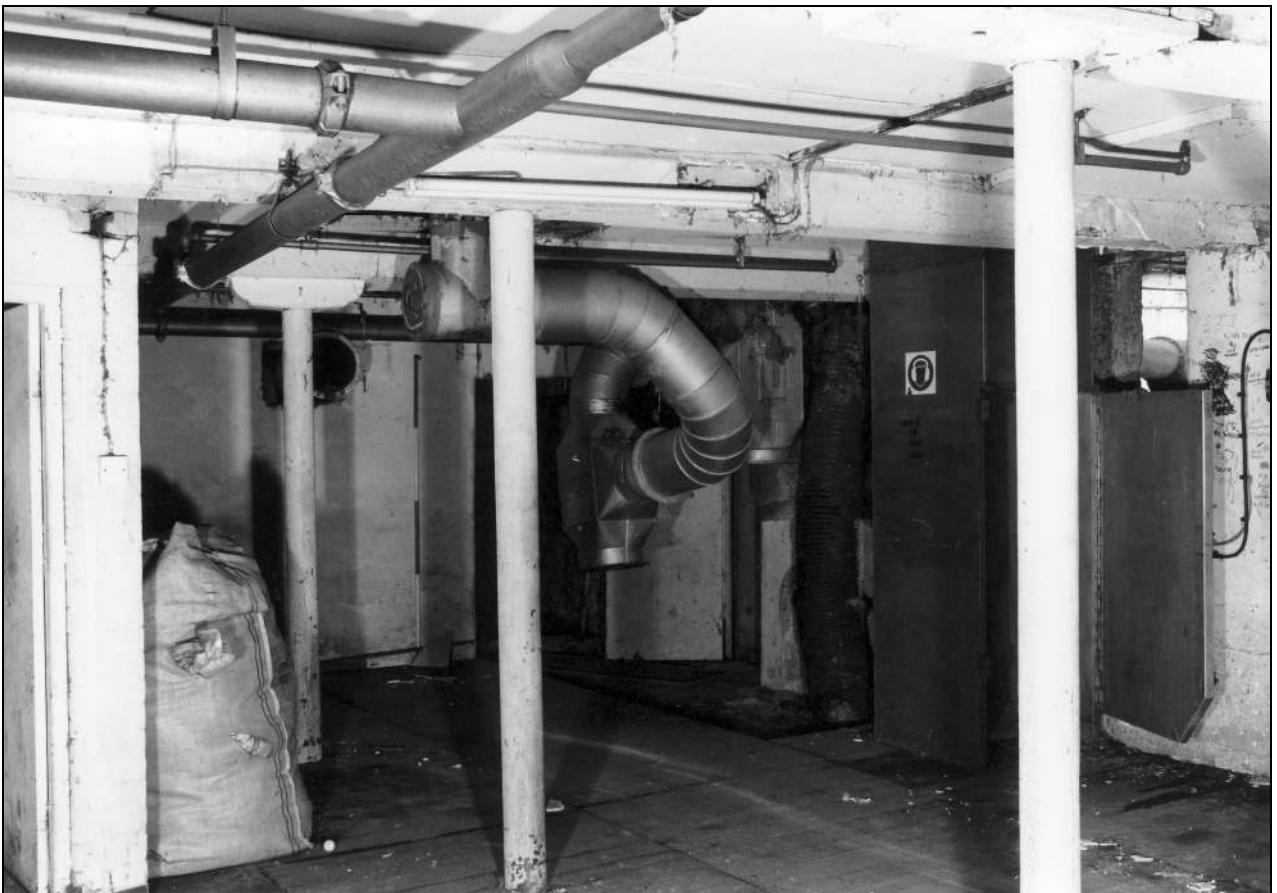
Ground floor of spinning mill, from the north-west (film 7, frame 1)
